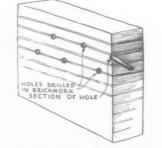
The Dryco-Rensec method of waterproofing damp walls.
